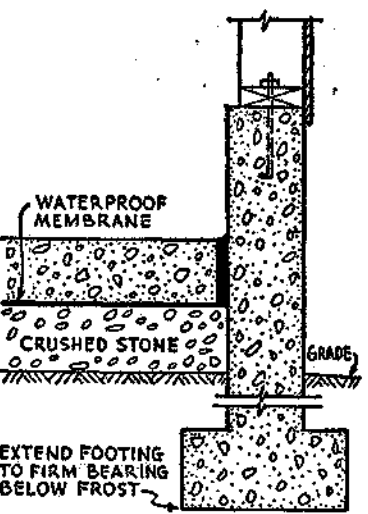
Typical floor construction for corn cribs or granaries. Foundation wall extending 18 in. above the floor helps keep out moisture and rats.
